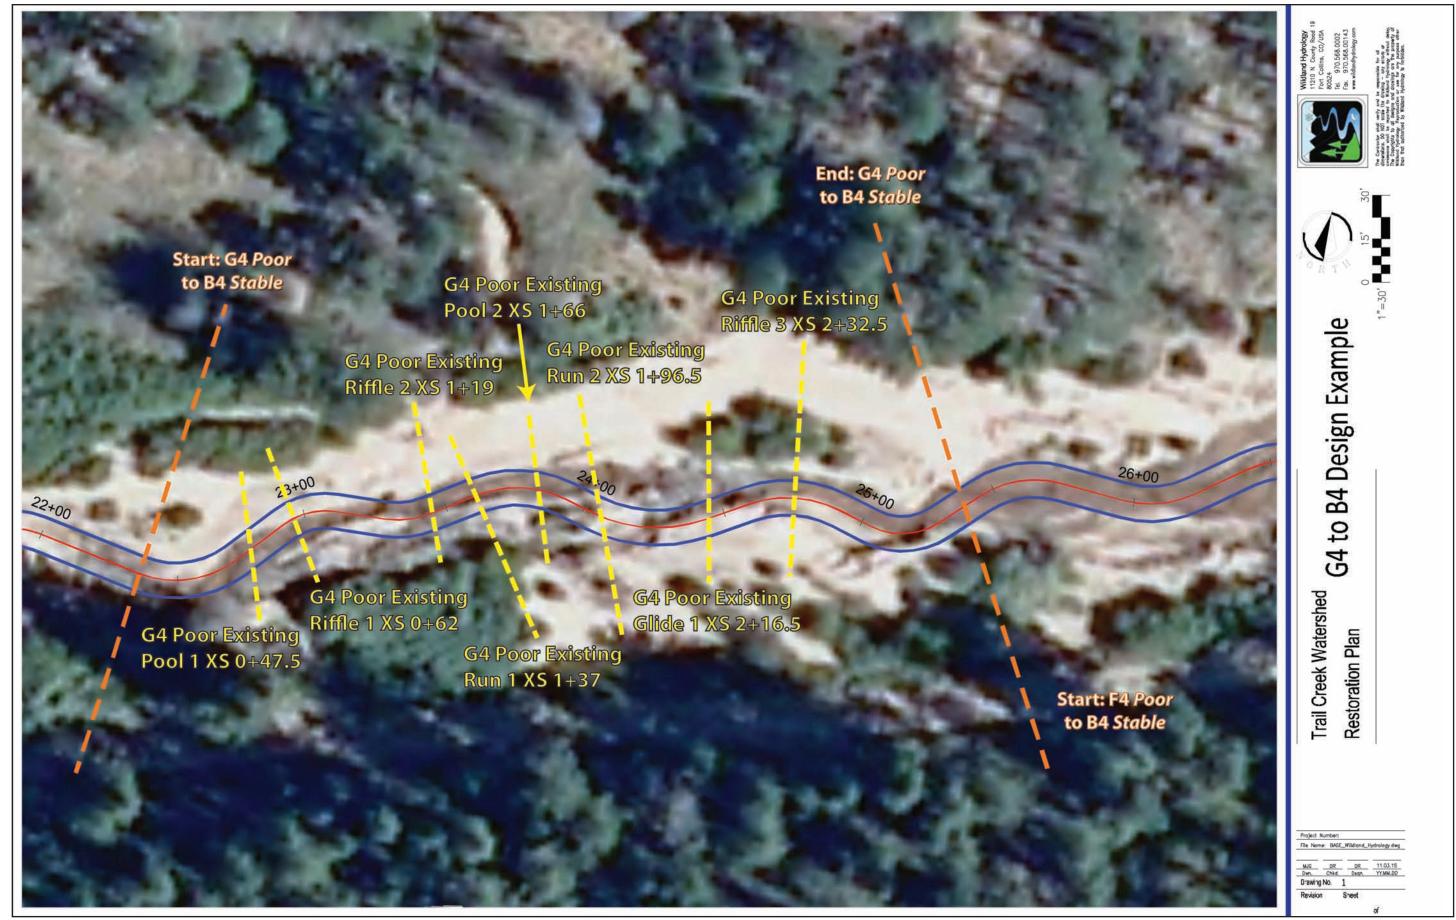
Plan view of the proposed conversion of the G4 to B4 stream type, including the existing G4 cross-section locations.
